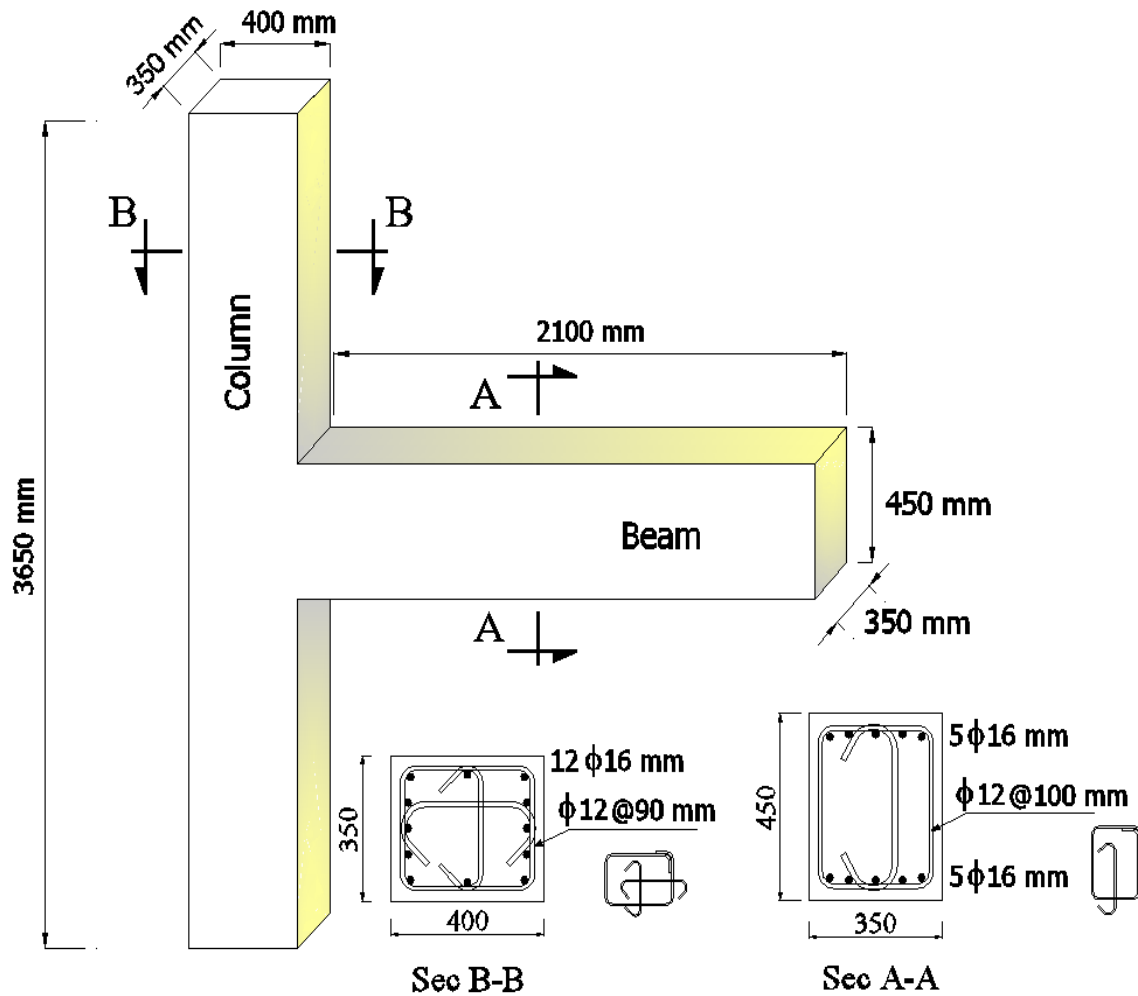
Specimen II-30-0.85 dimensions and reinforcement
